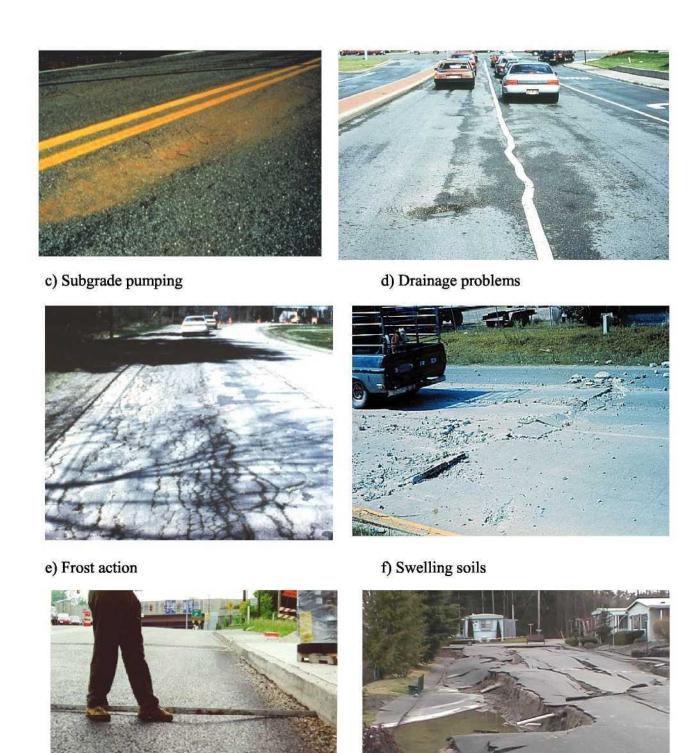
Examples of geotechnical related pavement failures (continued).
